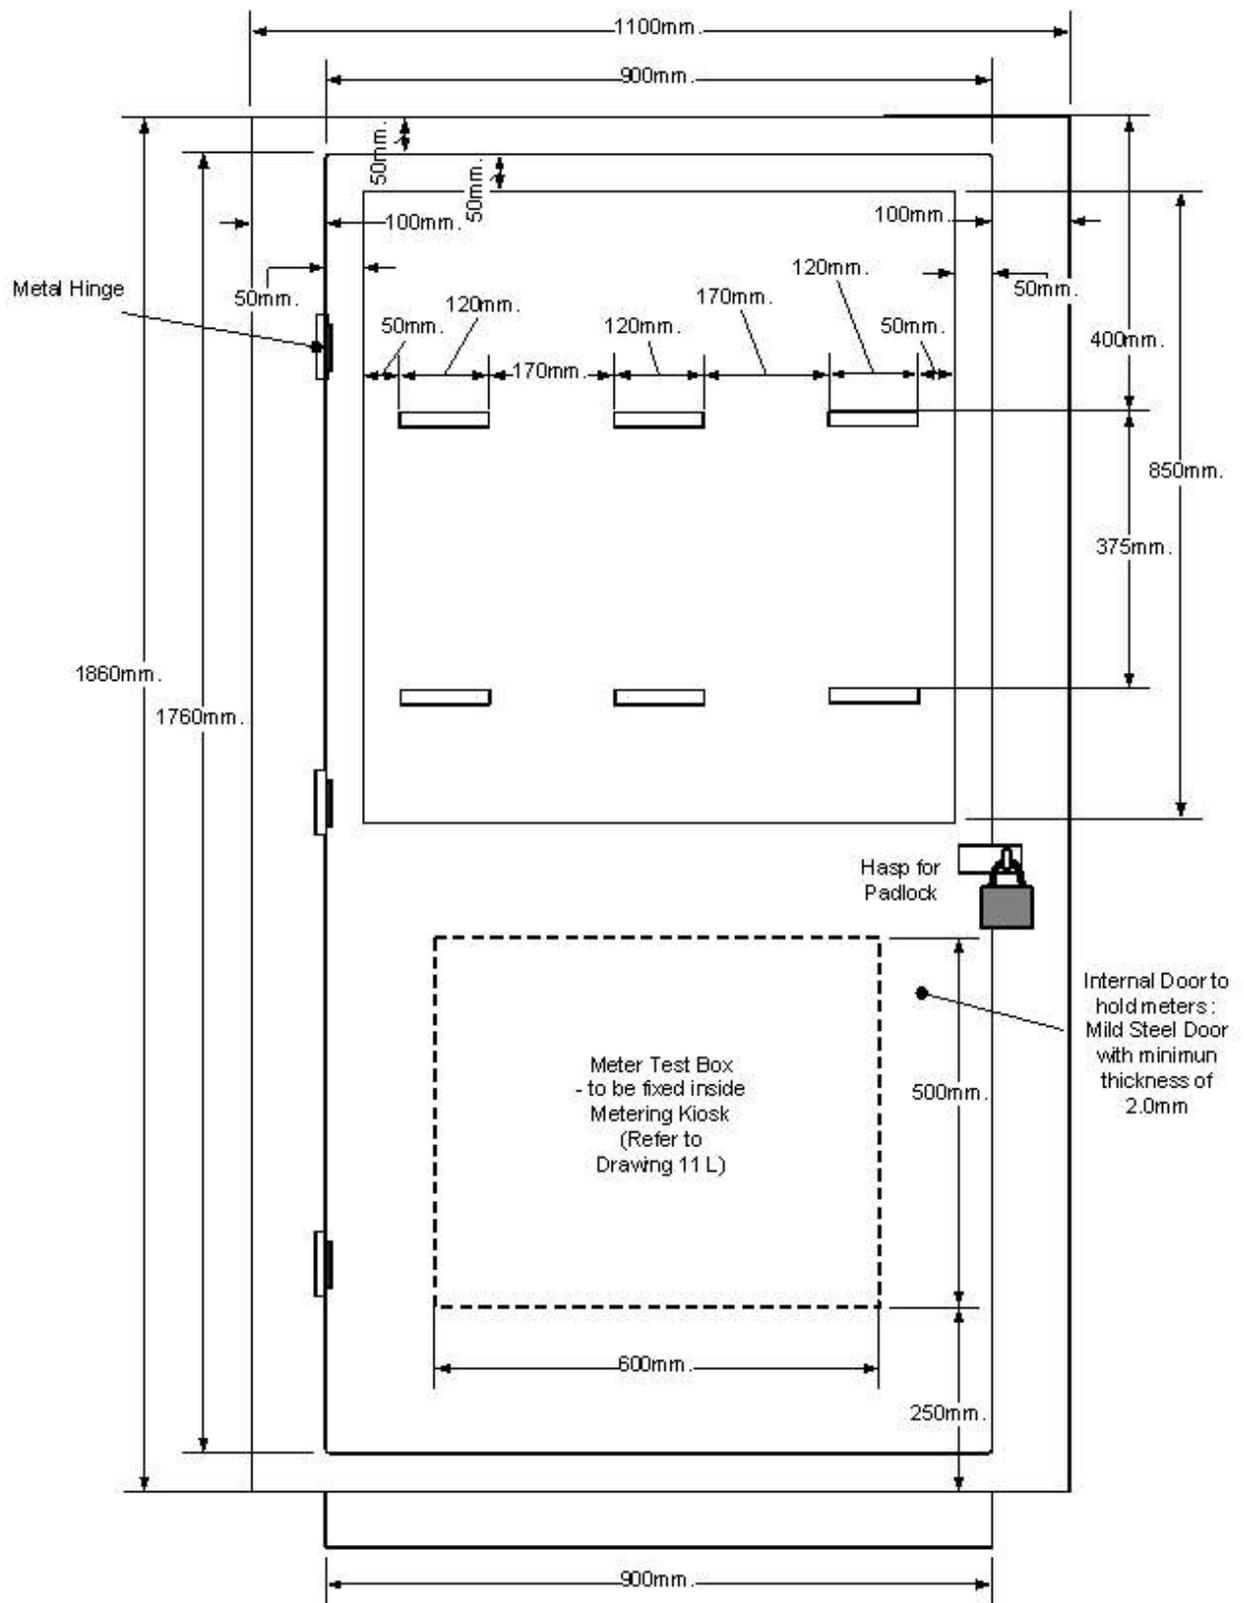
D : MV/HV, 1 OR 2 FEEDER METERING KIOSK - Front View of Kiosk Base
